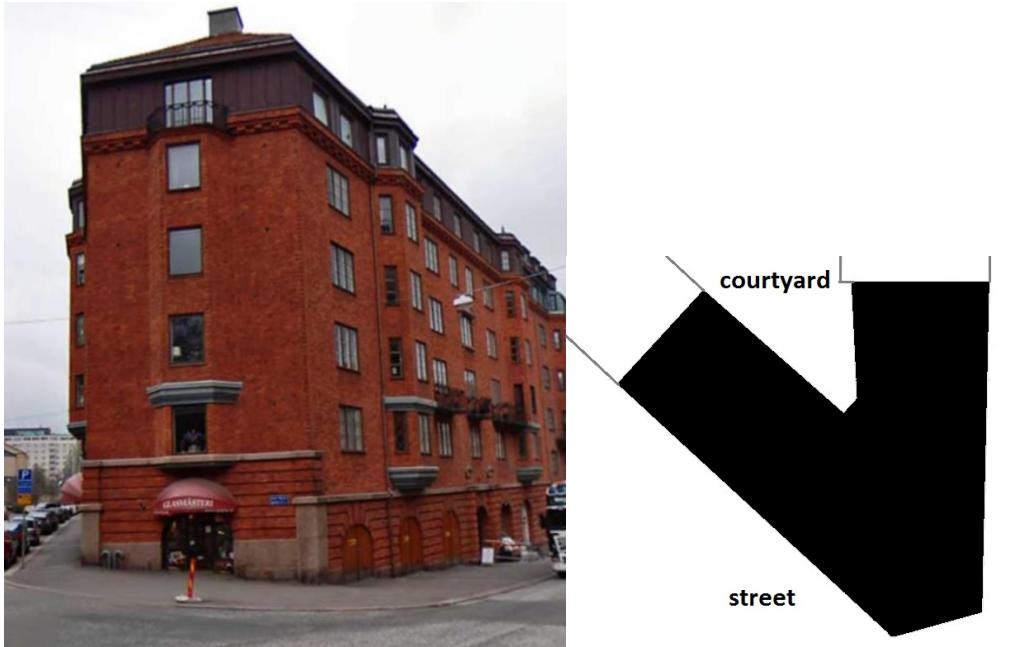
Left: Street view of building 1. Photo: Hitta.se. Right: Orientation of building 1.
